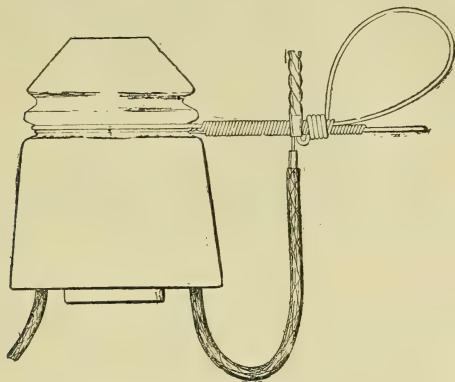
Single Terminating of 100-lb. Copper Wire
